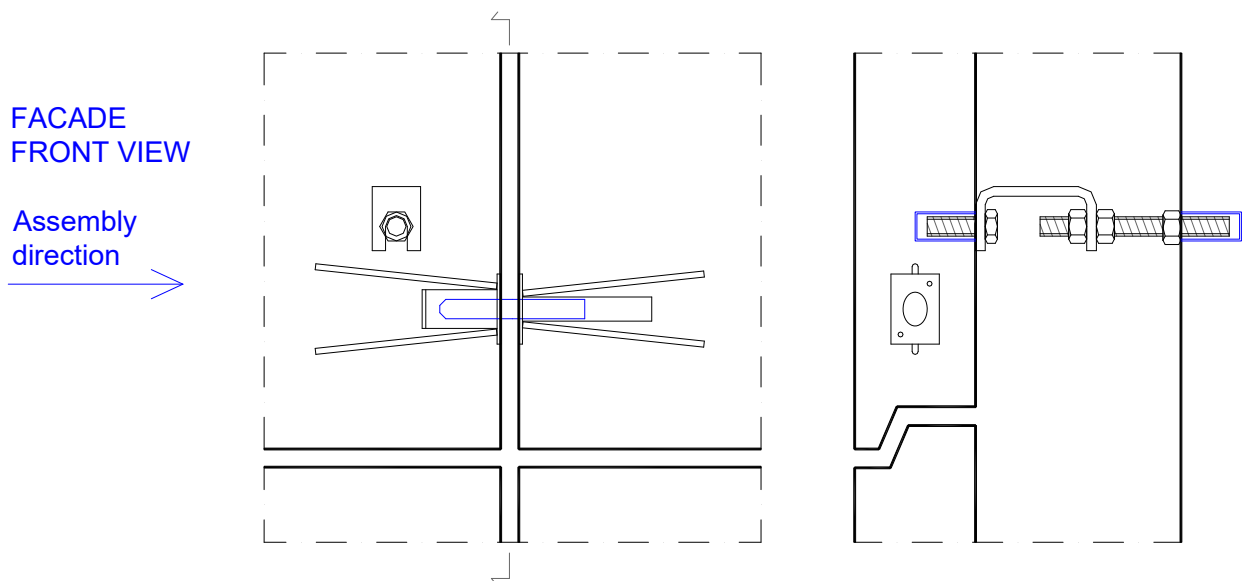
Structural detail with horizontal tongue and groove joint where the dowel connection is placed in the panel vertical joint.
